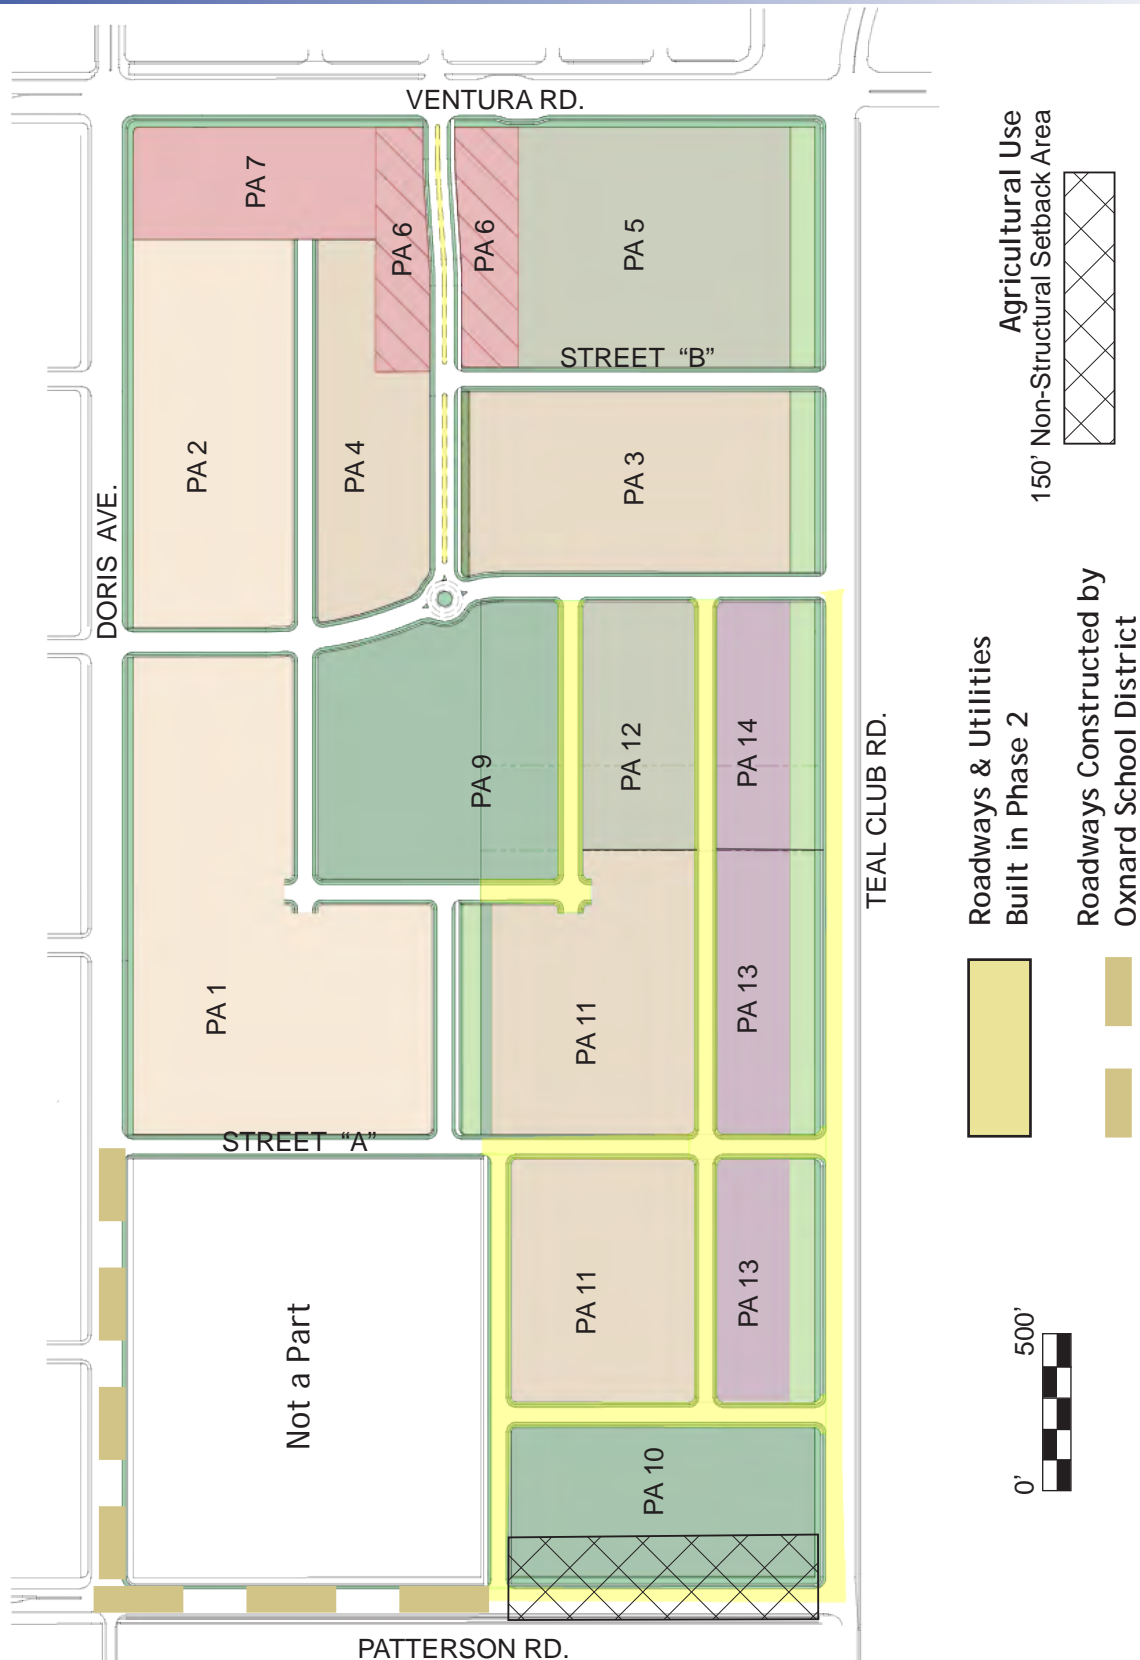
PROPOSED BUILD-OUT IMPROVEMENT PLAN
